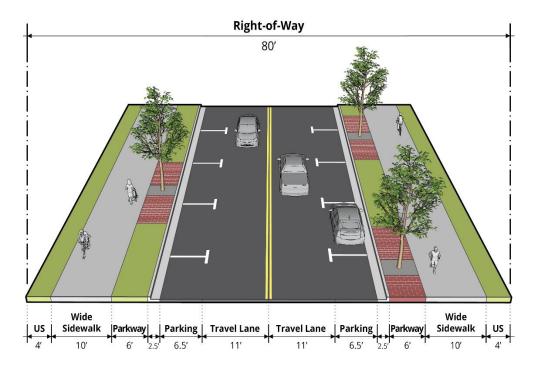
Urban Avenue Cross Section Standards – Wide Sidewalk
